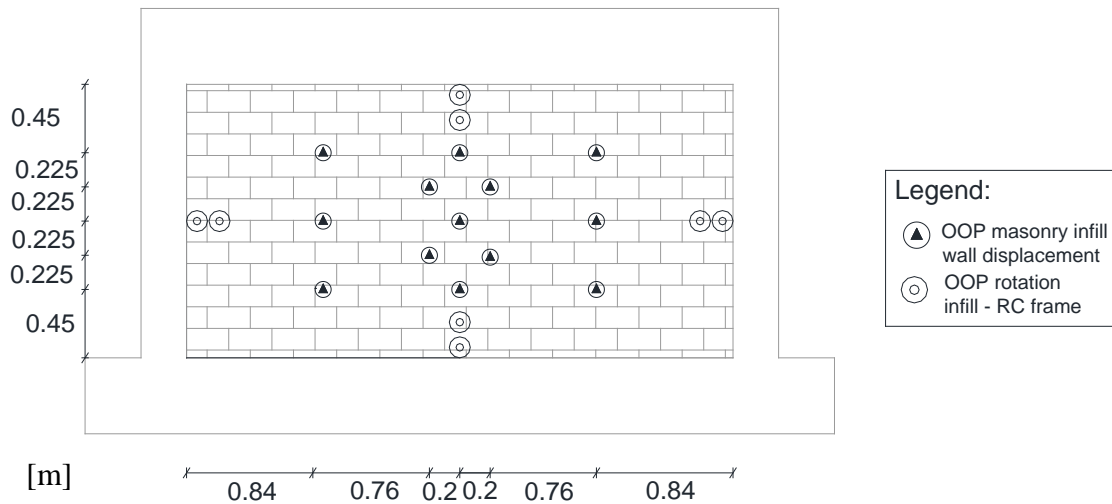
Layout of the out-of-plane test instrumentation (in meters).
